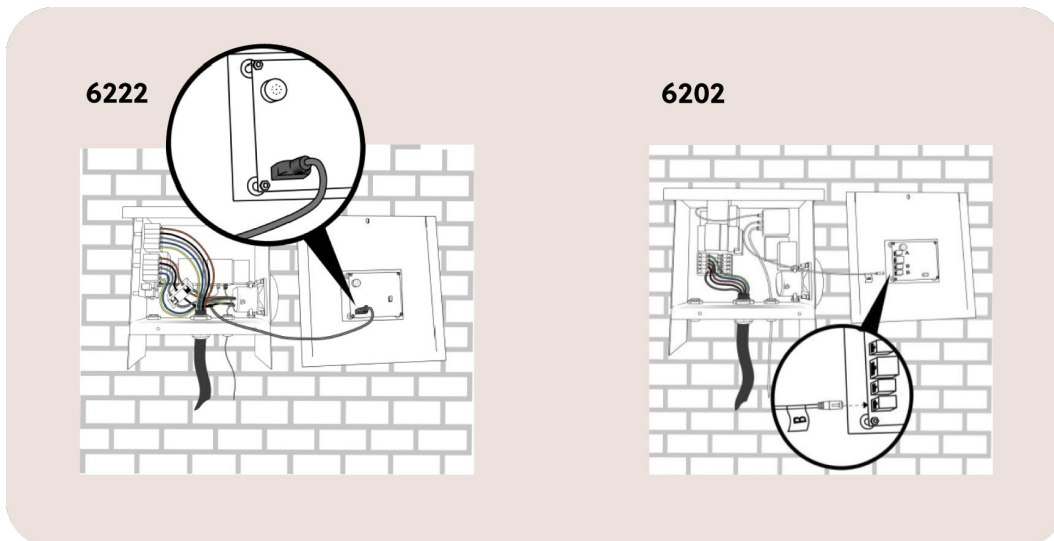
View on the 12-pin cable (6222) and the RJ10 cable on the B-port (6202) on the PCB
